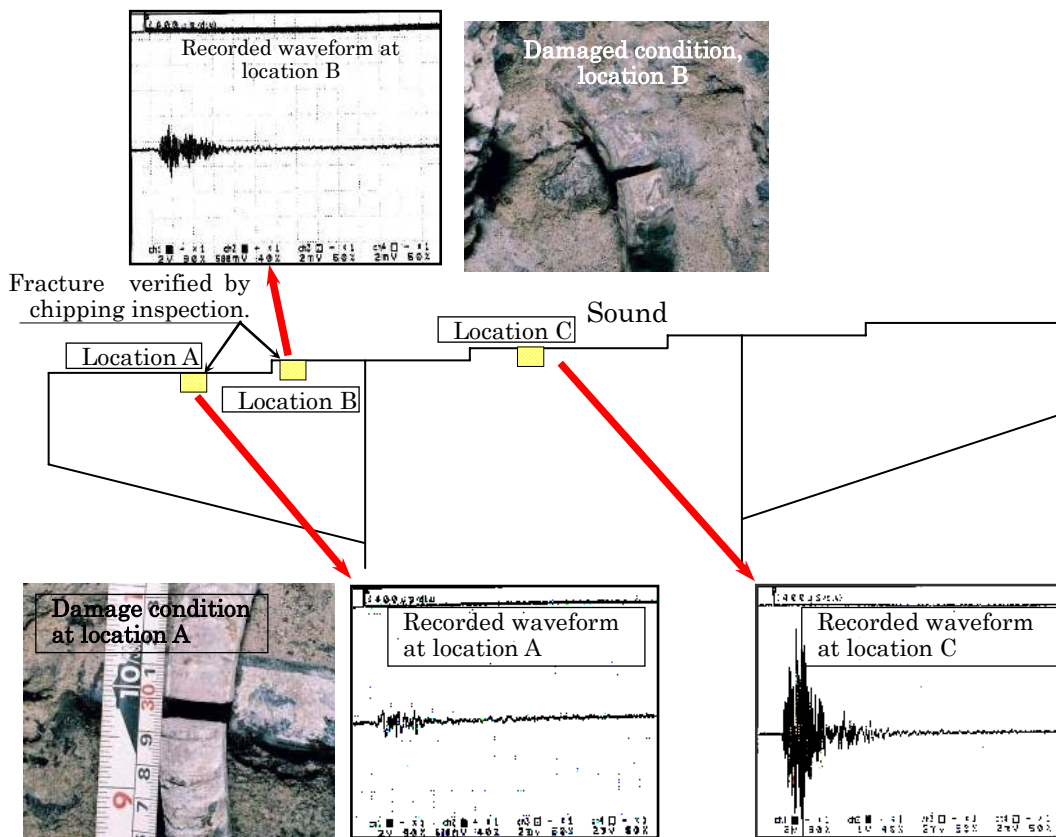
Examples of recorded waveforms from existing bridge pier.
